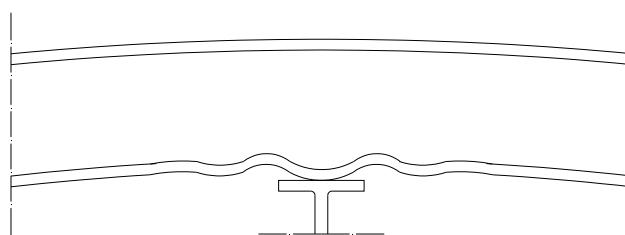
Buckling and bending failure of a sandwich face over a support.
